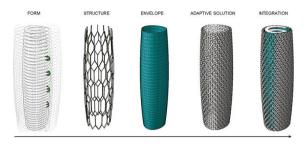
The layers of Al Bahr Tower's façade skin- (Al Bahar Towers)
